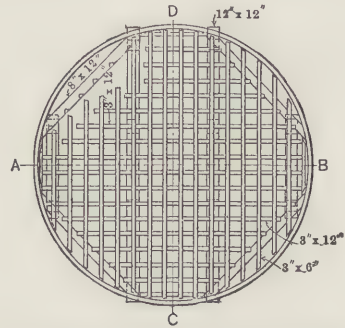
PLAN OF GRILLAGE SUPPORTING THE TANK BOTTOM
